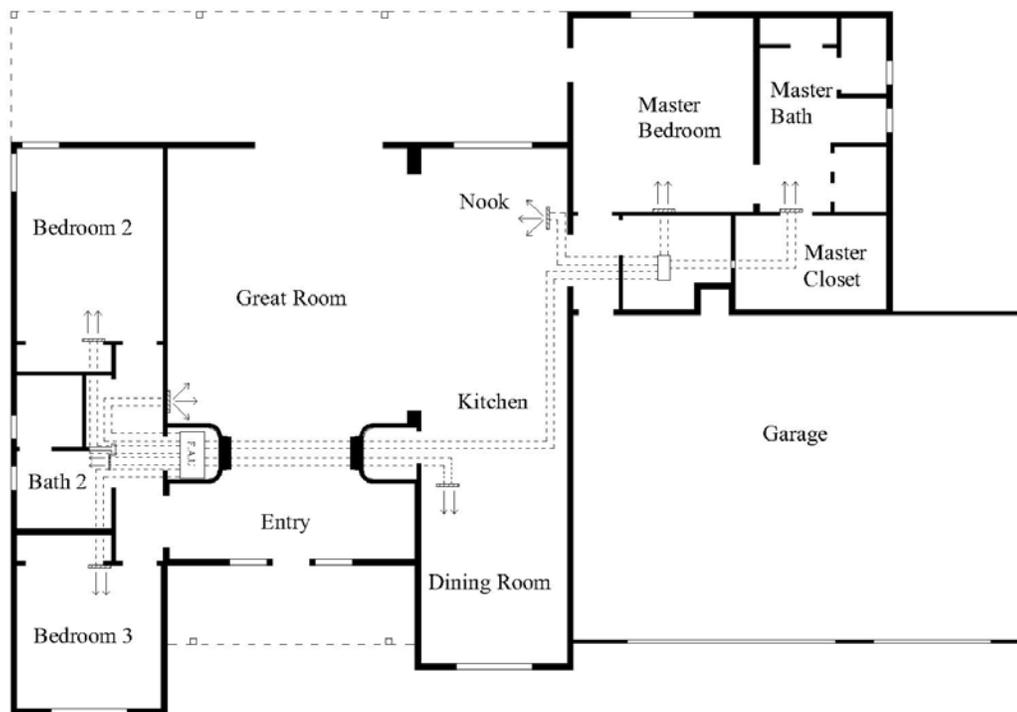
Attic duct chase plan for Northwest Homes 2,205-ft² plan
